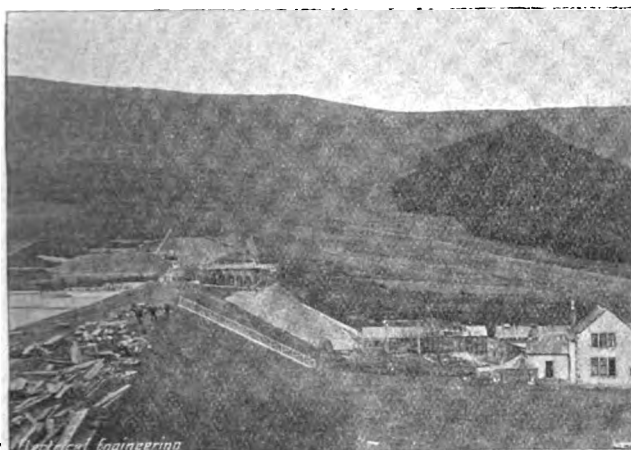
CONSTRUCTION WORKS, GLENQUEY RESERVOIR.
